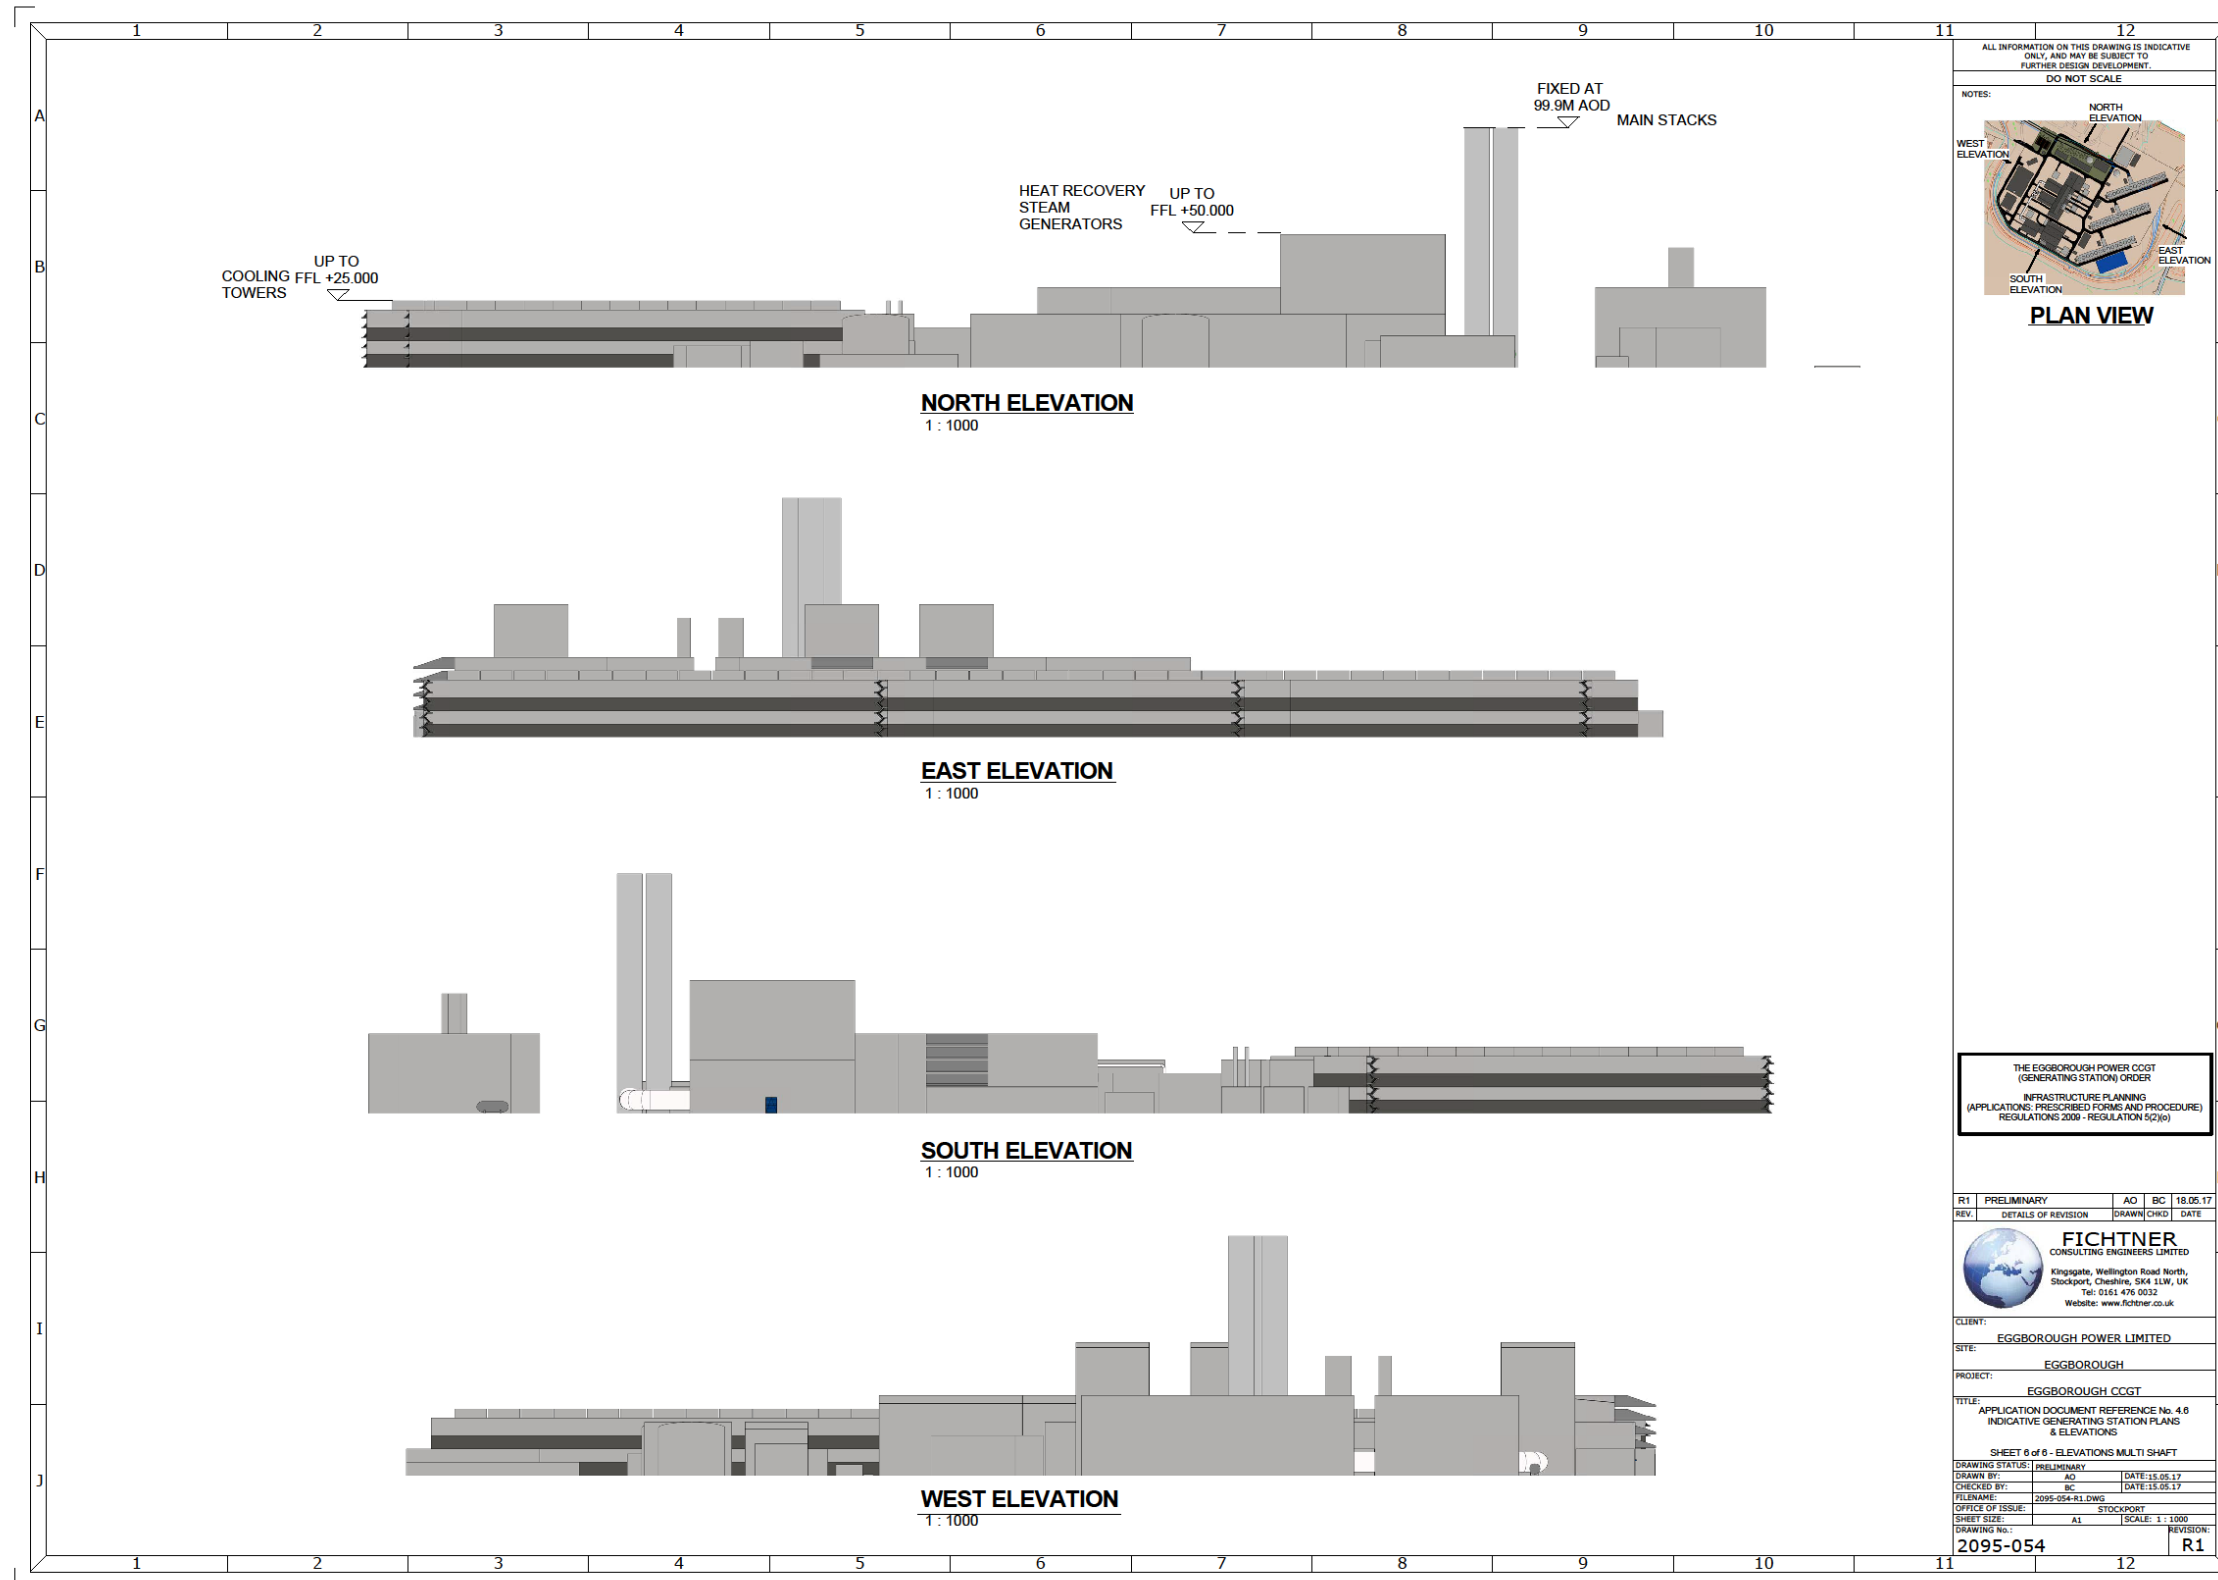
Proposed Power Plant Elevations (Multi-shaft)
